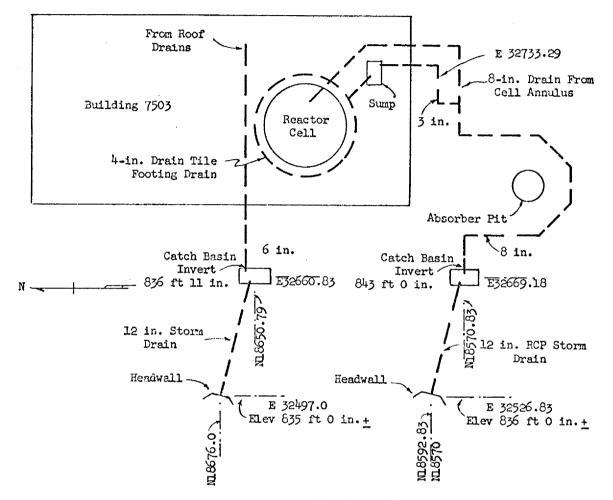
Schematic diagram of Building 7503 drainage plan.
